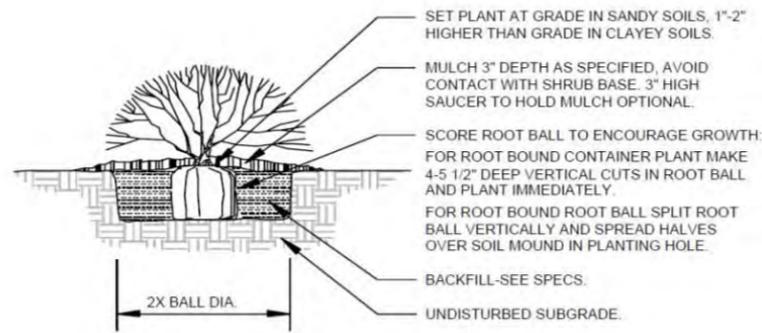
Typical Detail for Shrub Planting (UDFCD 2001).
